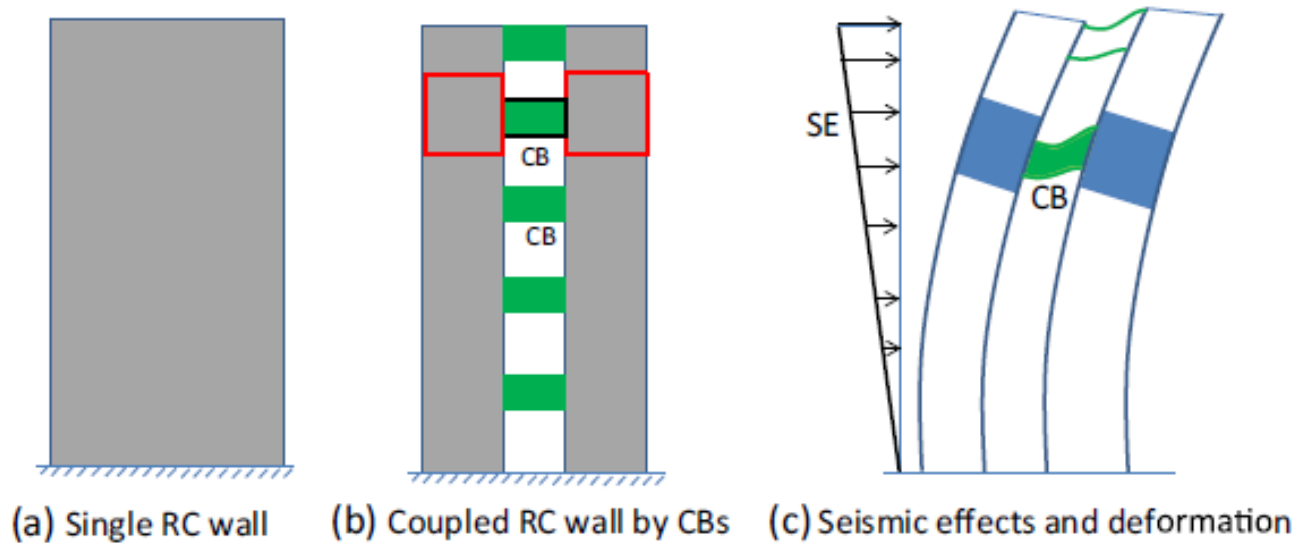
Reinforce concrete (RC) wall, Coupled RC wall by coupling beams (CB) and deformation due to seismic effects (SE) (Gaochuang et al., 2016)
